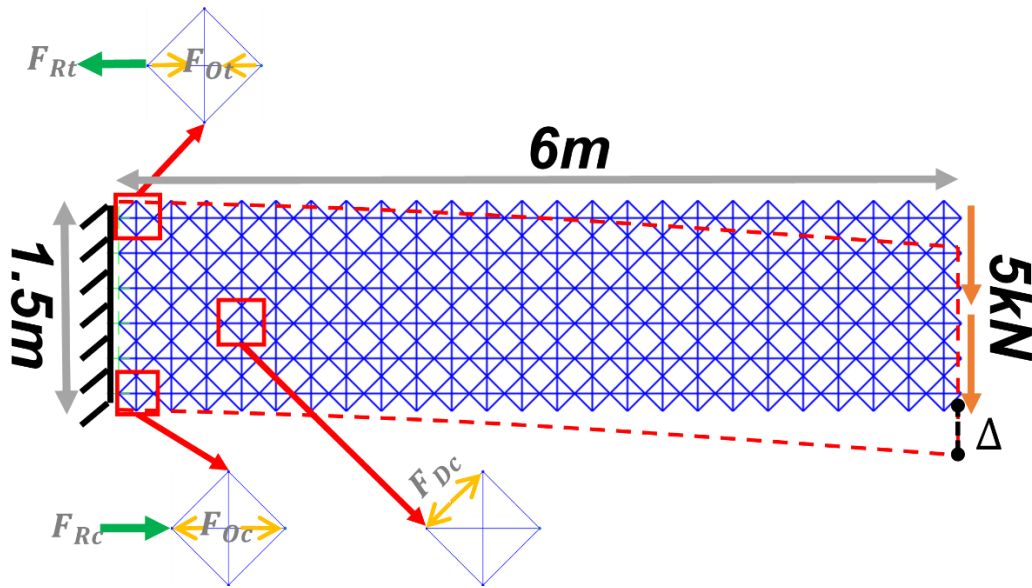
Truss model with aspect ratio 4 considered to investigate internal truss element forces
